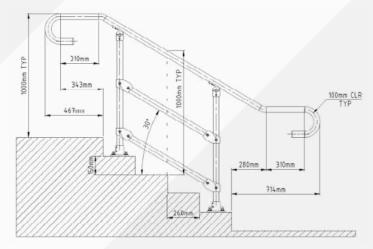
(C) STAIR HANDRAILS—HANDRAIL TERMINATIONS
